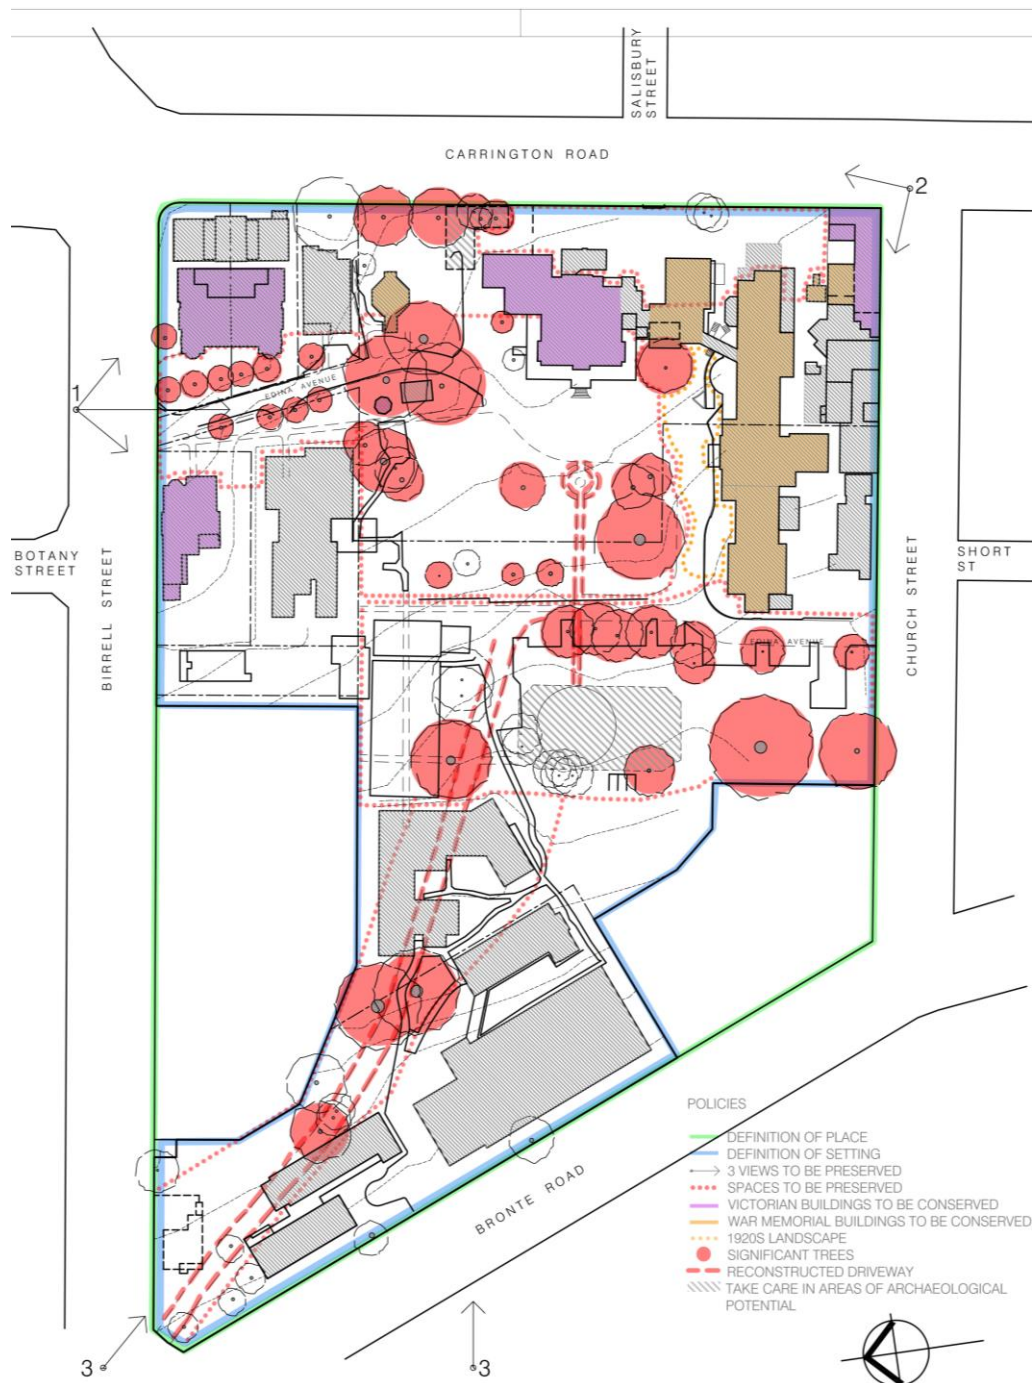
Site plan illustrating conservation policies. (Source: Hector Abrahams Architects)
